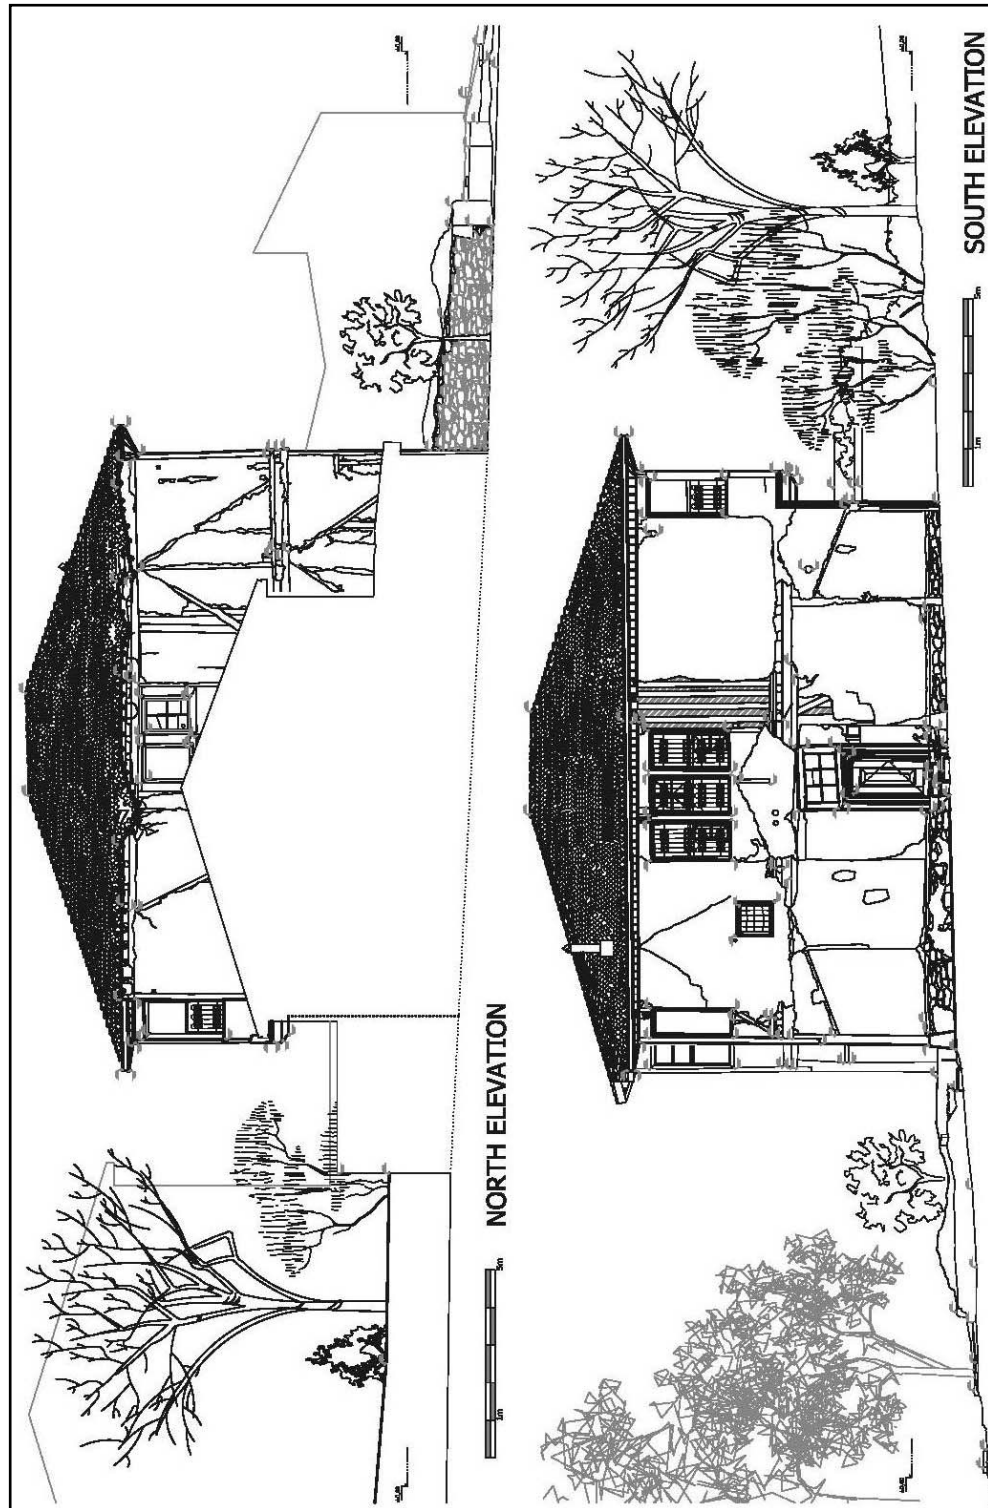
North and South Façades: 1/200 (presented in 1/100 at Jury)
